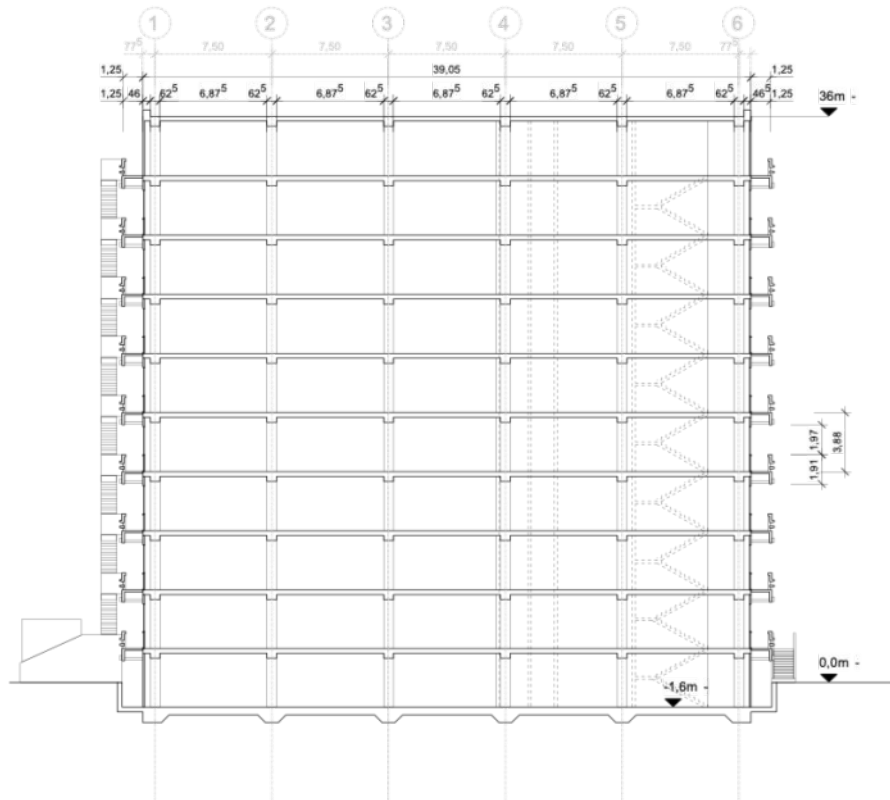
Sect on BB of the existing building under investigation for the timber-reuse retrofitting.
